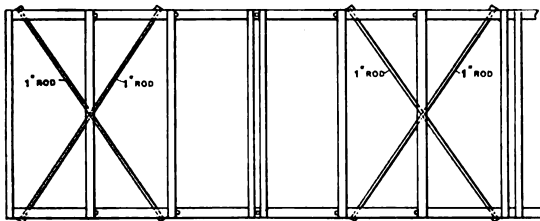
Half Plan of Lower Floor, Showing Truss Rods.
